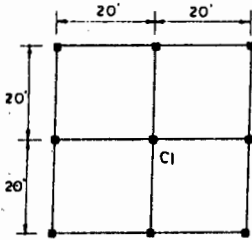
Plan of Example Problem 1 Fig. 3. Plan of Example Problem 2
